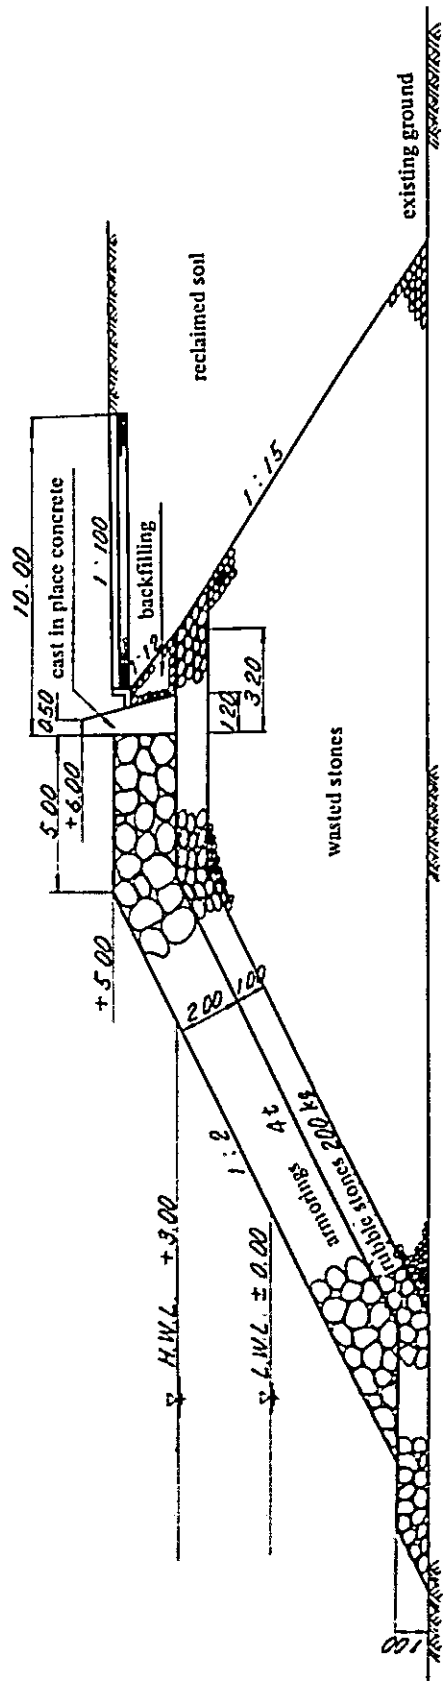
Standard Cross Section of Seal Wall (South Caldera)
